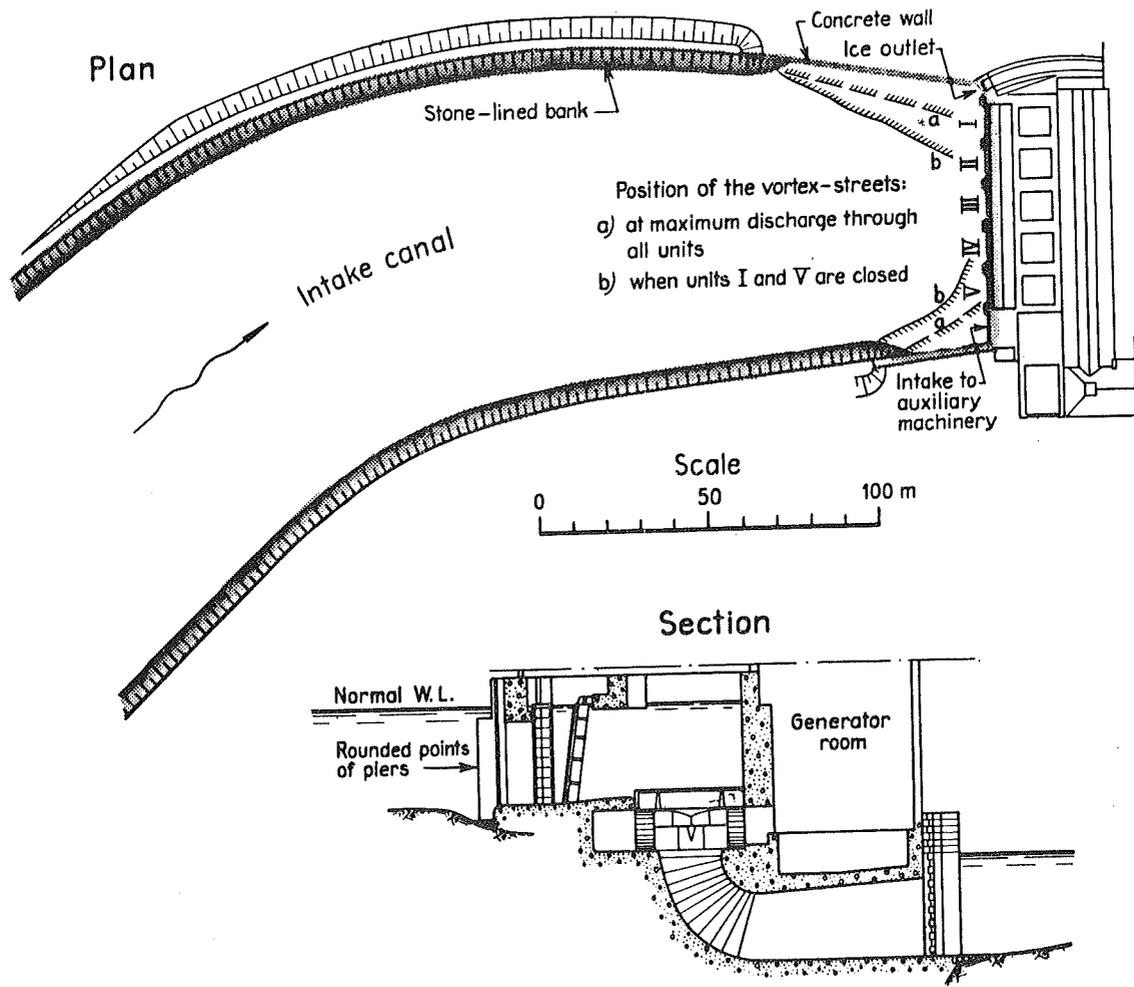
Untra Power Plant plan and section, taken from Rahm [3].
